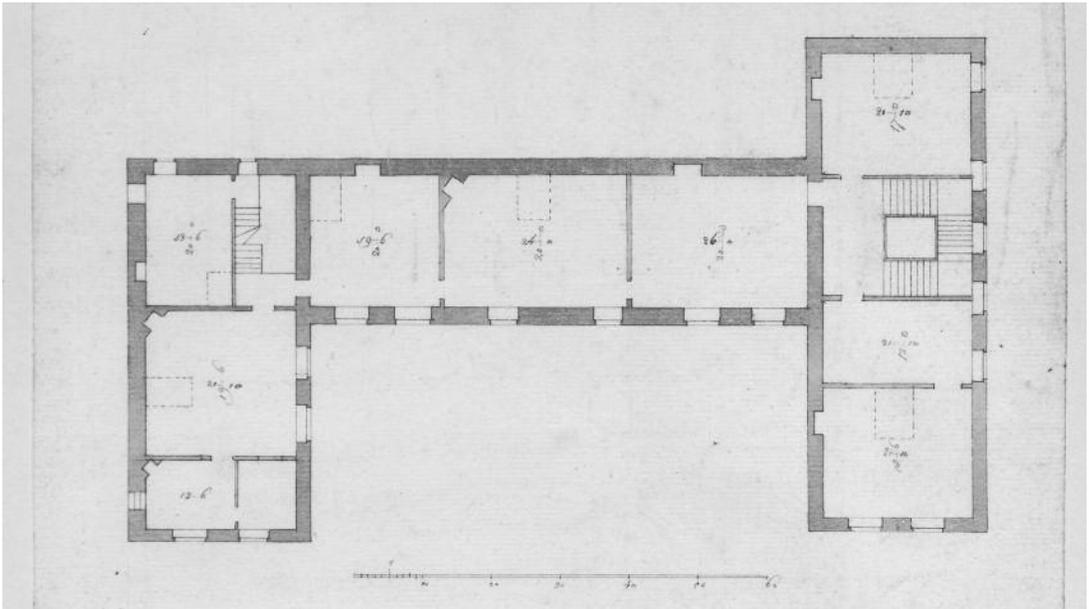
Colen Campbell, elevation and plans of the old house at Goodwood, Sussex.
